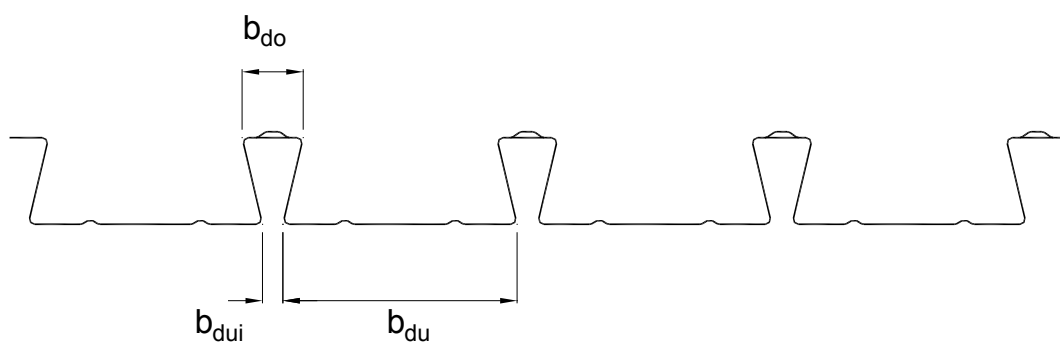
Measurement of the upper and lower widths of dovetail stiffeners
